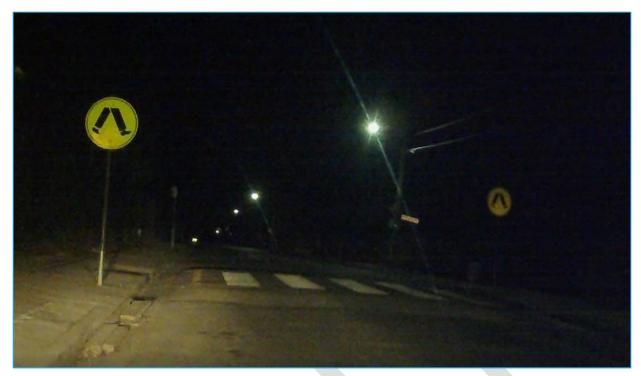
Poor lighting at the raised pedestrian crossing on Clarke Road
